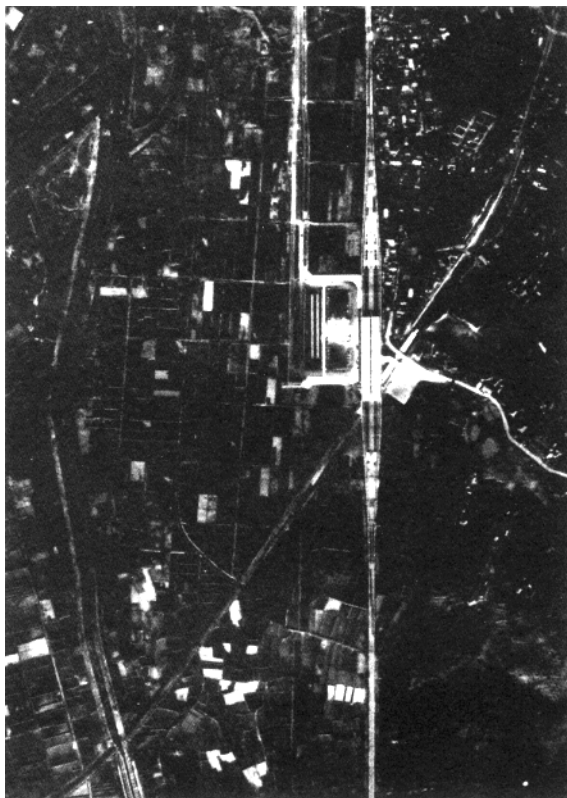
Shin-Yokohama Shinkansen Station Under Construction
